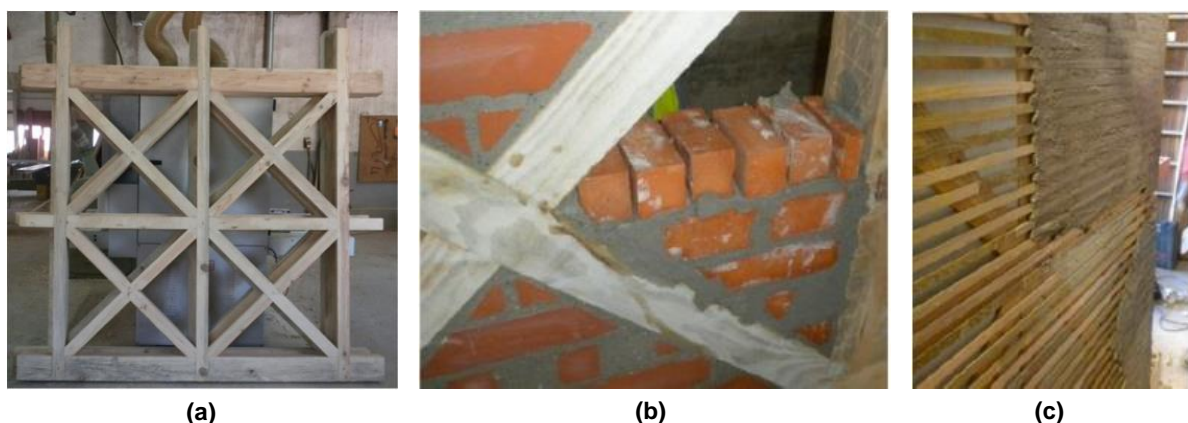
Tested walls: timber-framed wall (a), timber-framed masonry wall (b) (Gonçalves et al. 2012).
